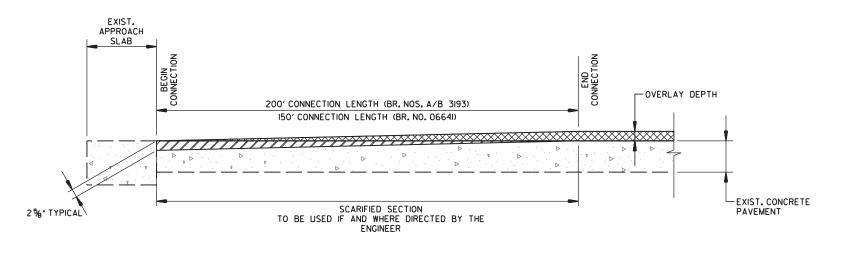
DETAIL FOR PAVEMENT TRANSITION AT END JOB
